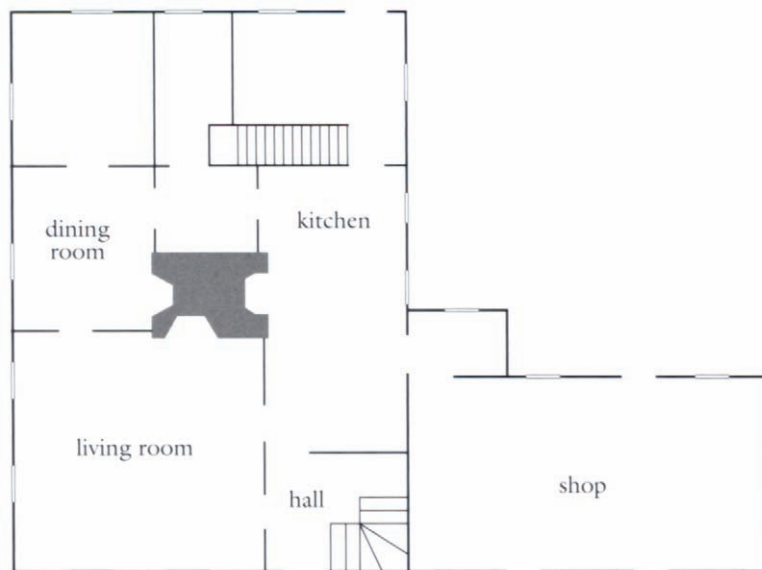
Plan of Christopher Townsend house and shop. Adapted from plan drawn by Warren Oakley, pl. 95 in Downing and Scully 1967
